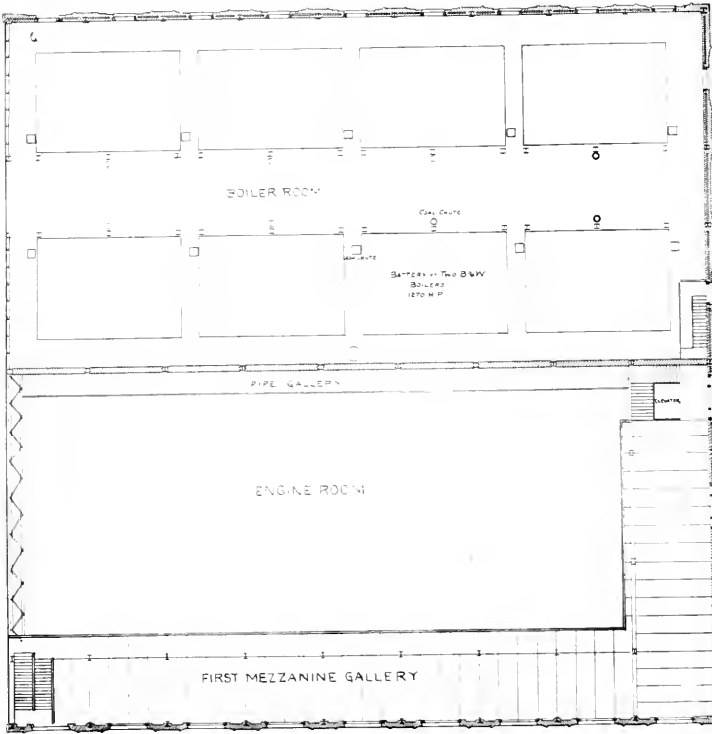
FIRST FLOOR PLAN OF POWER HOUSE.
